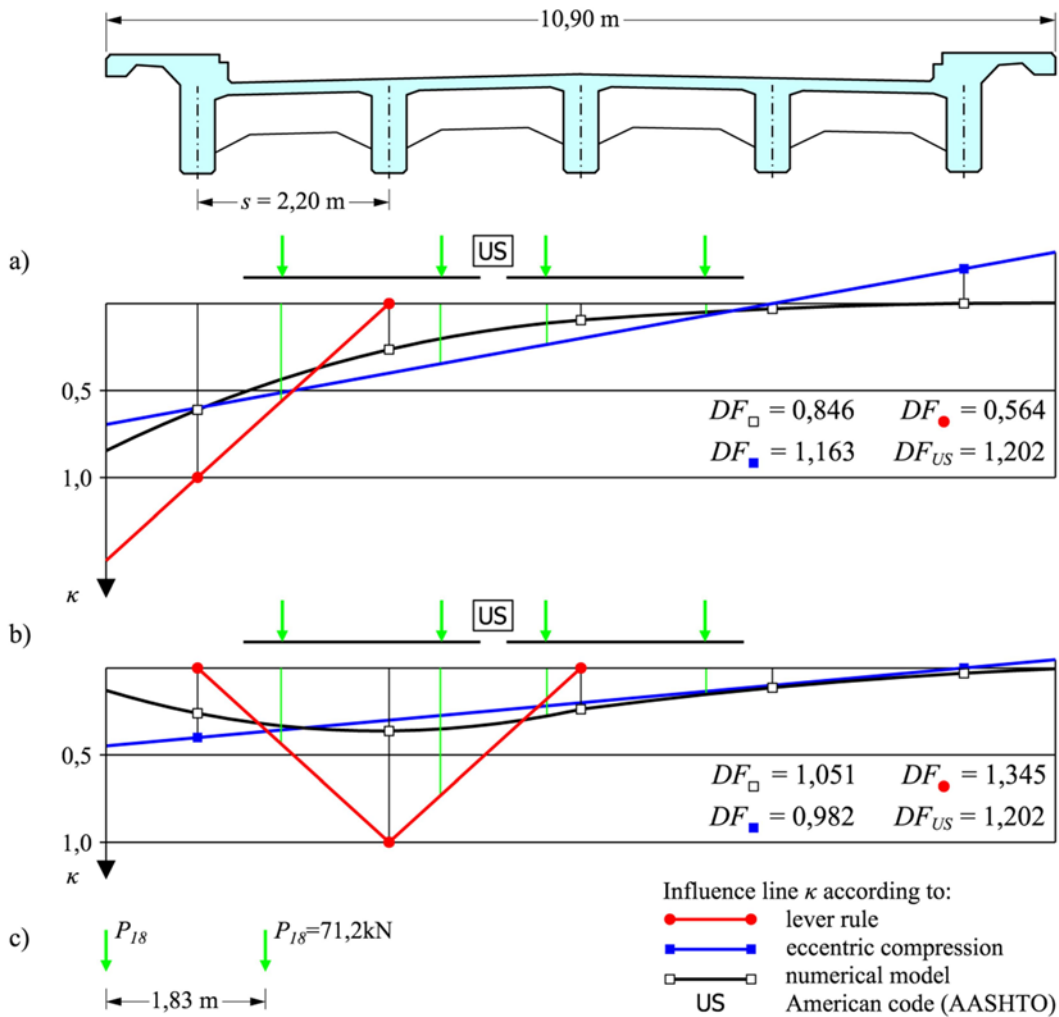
Load distribution in a five-girder concrete bridge: a) external girder, b) internal girder c) AASHTO assessment vehicle
